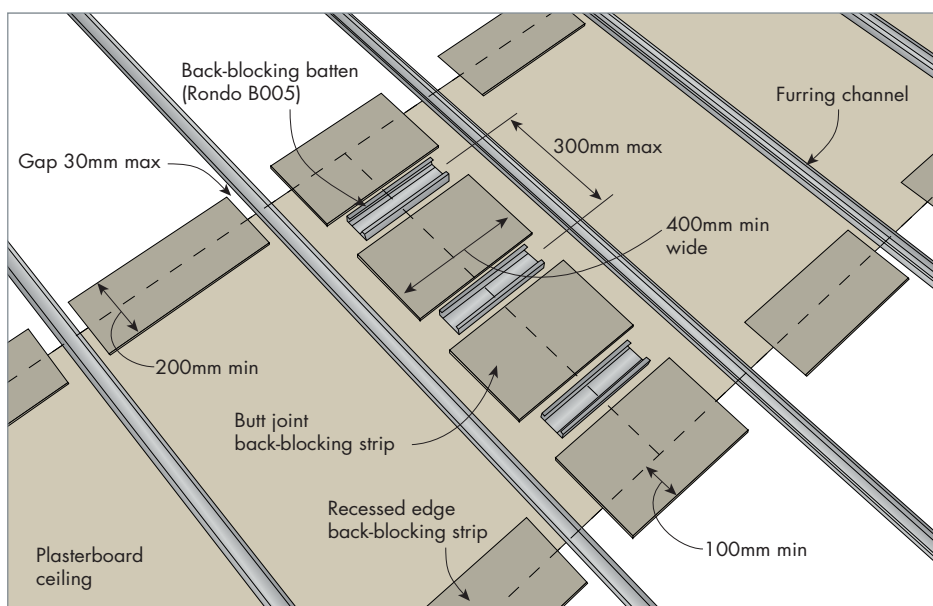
Placement of Back-Blocking Batten and Back-Blocking Strips for Recessed and Butt Joints
